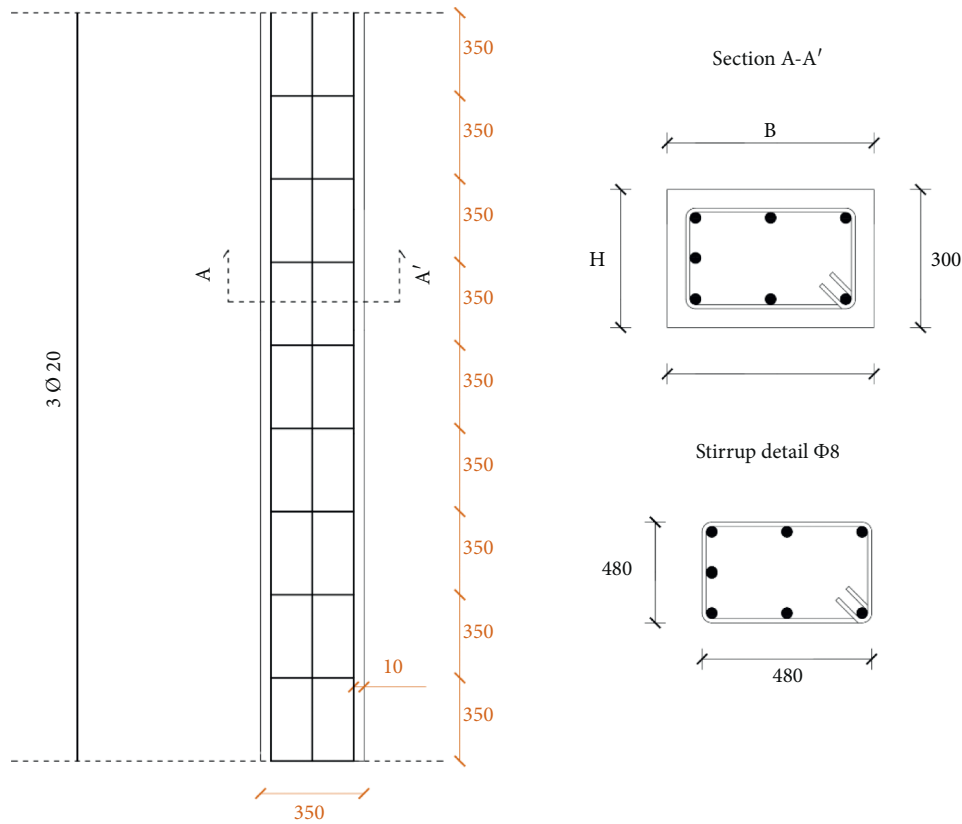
Identification of internal reinforcing bars of the column: cross section (a) and longitudinal section (b).
